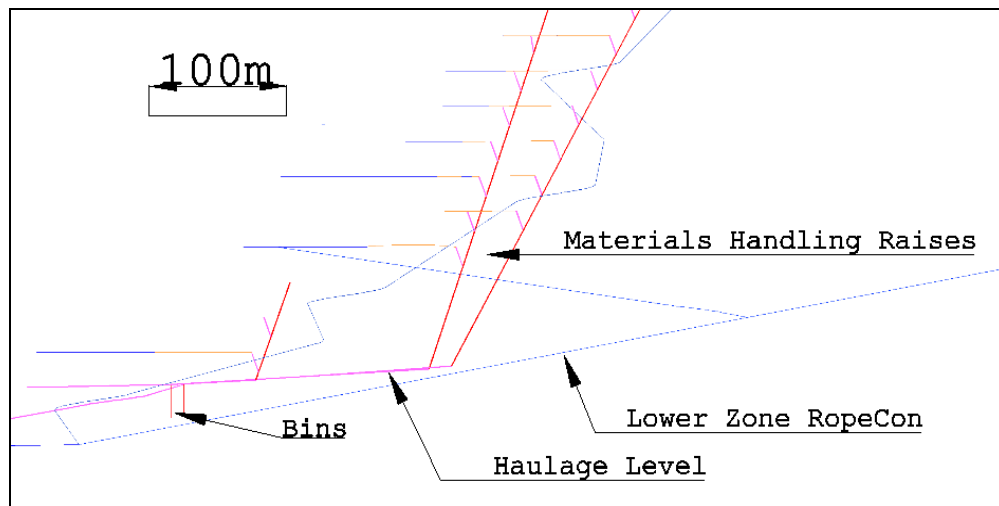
Lower Mine Materials Handling Schematic (Section facing Northwest)
